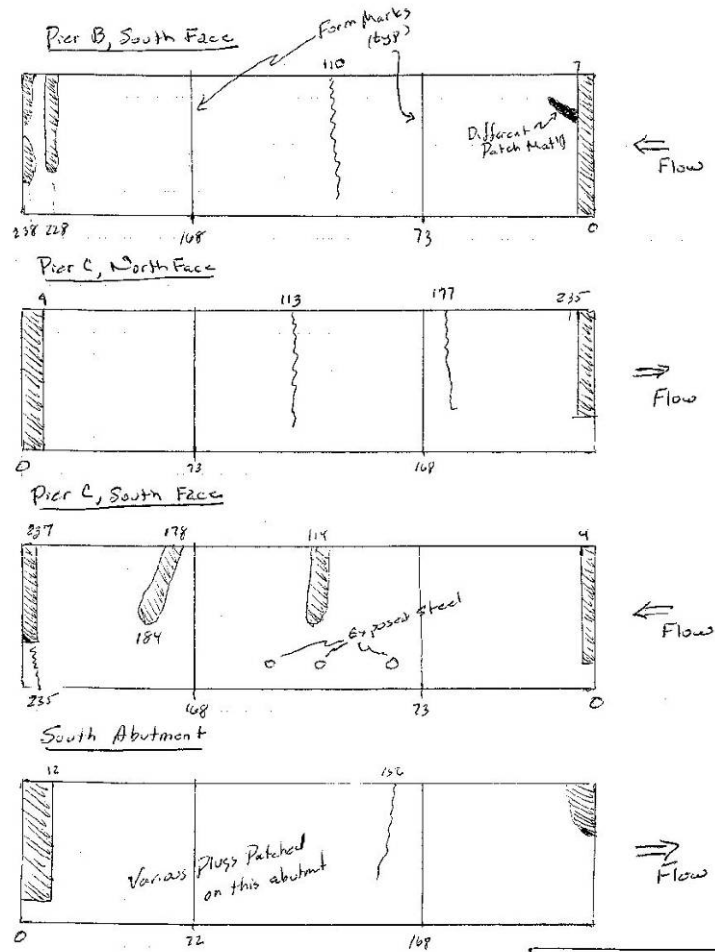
Pier wall sketches of Culvert #2 (sheet 1 of 2).
